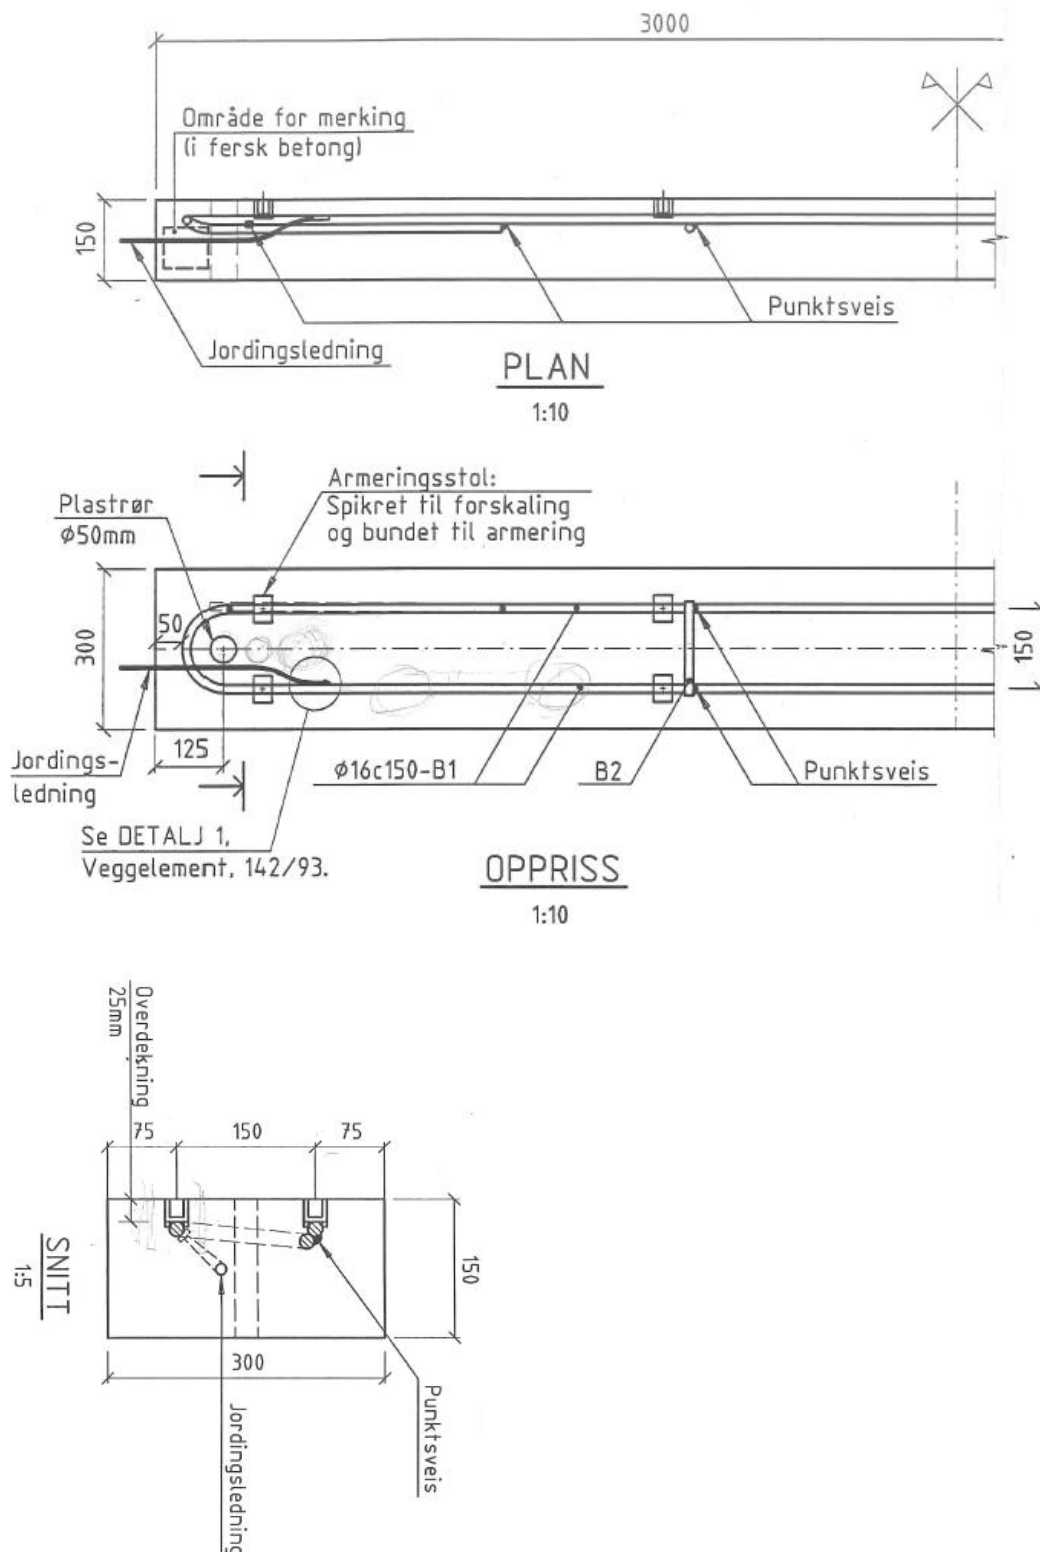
Constructional drawing of the concrete beams. From Holtmon J.P. & Isaksen H.R., "Utvikling av kloridbestandig betong - Rapport fra produksjon av prøveelementer", Vegdirektoratet, Bruavdeling, 1994
